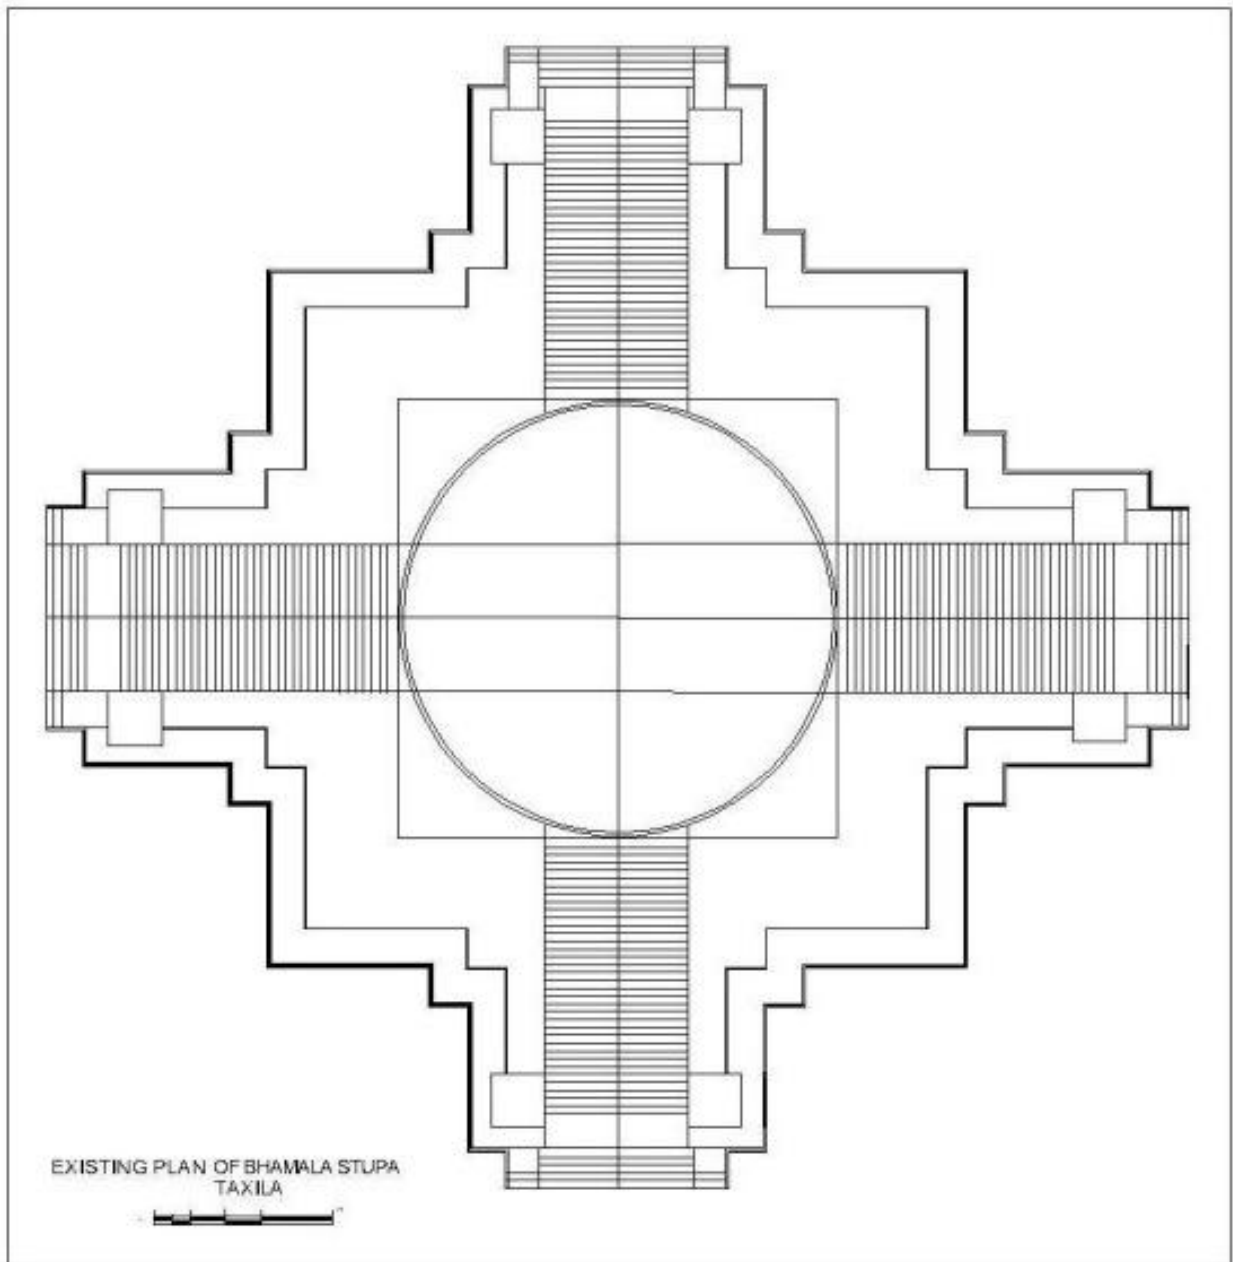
Existing Plan of Bhamala Stupa, Taxila
